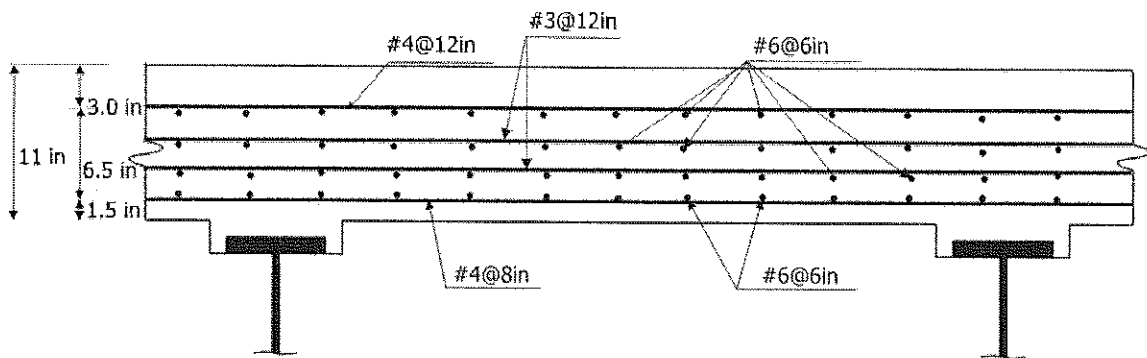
Middle cross section of the deck with thickness of 11 in. (four layers of reinforcement).
